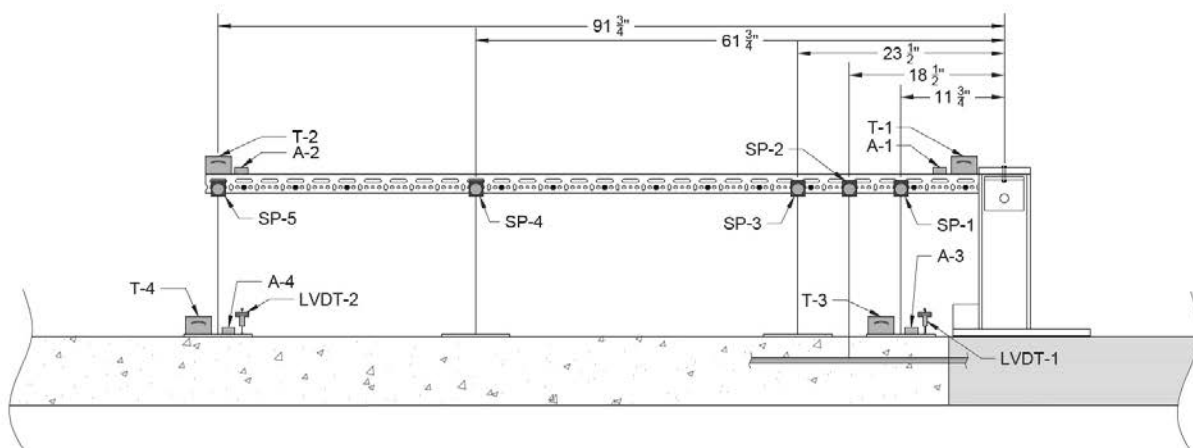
Instrumentation setup for the staged-construction monitoring of bridge B-16-136.
